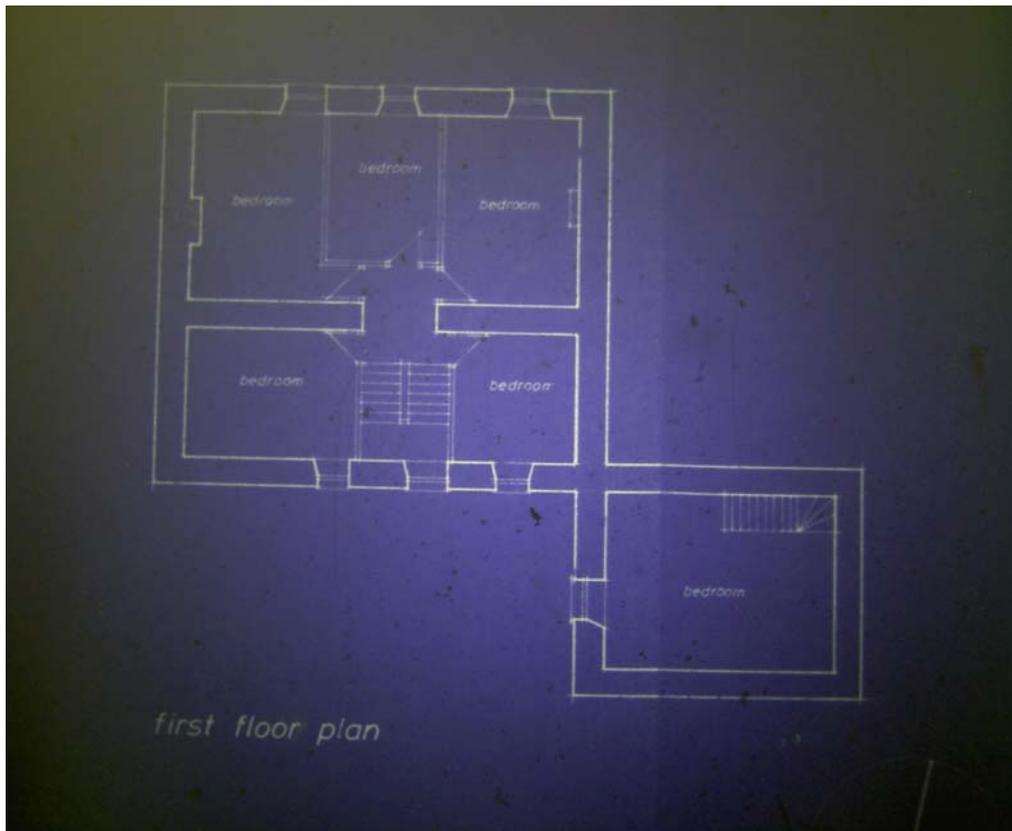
Existing first floor plan of the house in 1983 (from Anon 1983a)
